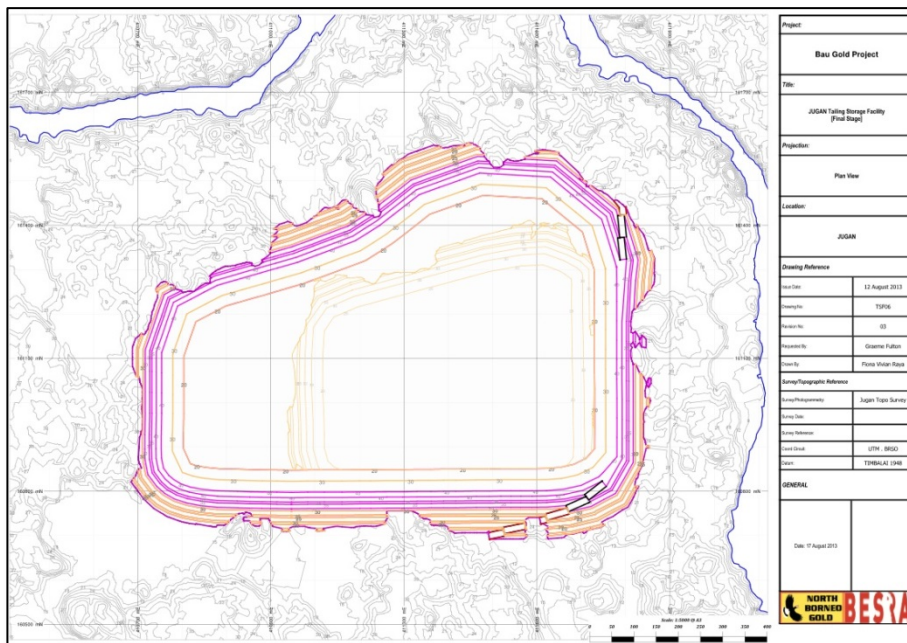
Plan View of Stage 3 of TSF at Jugan
